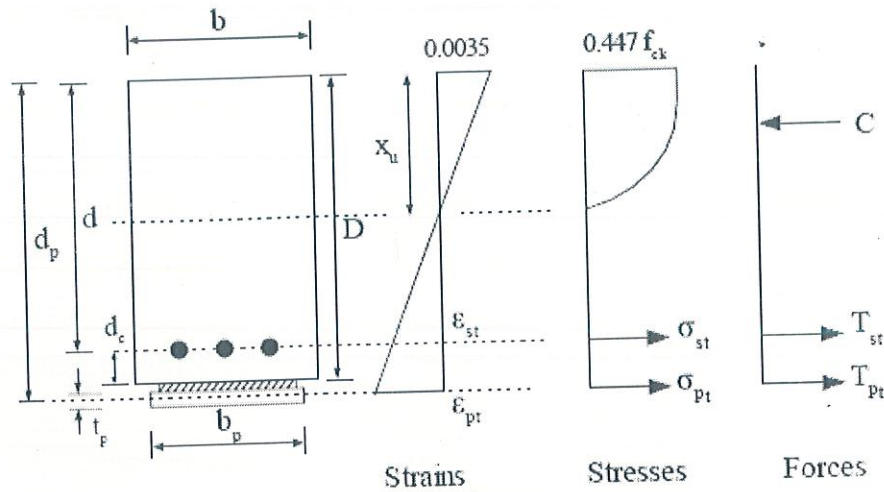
Strain and stress diagrams and internal forces of a tension-face plated beam
